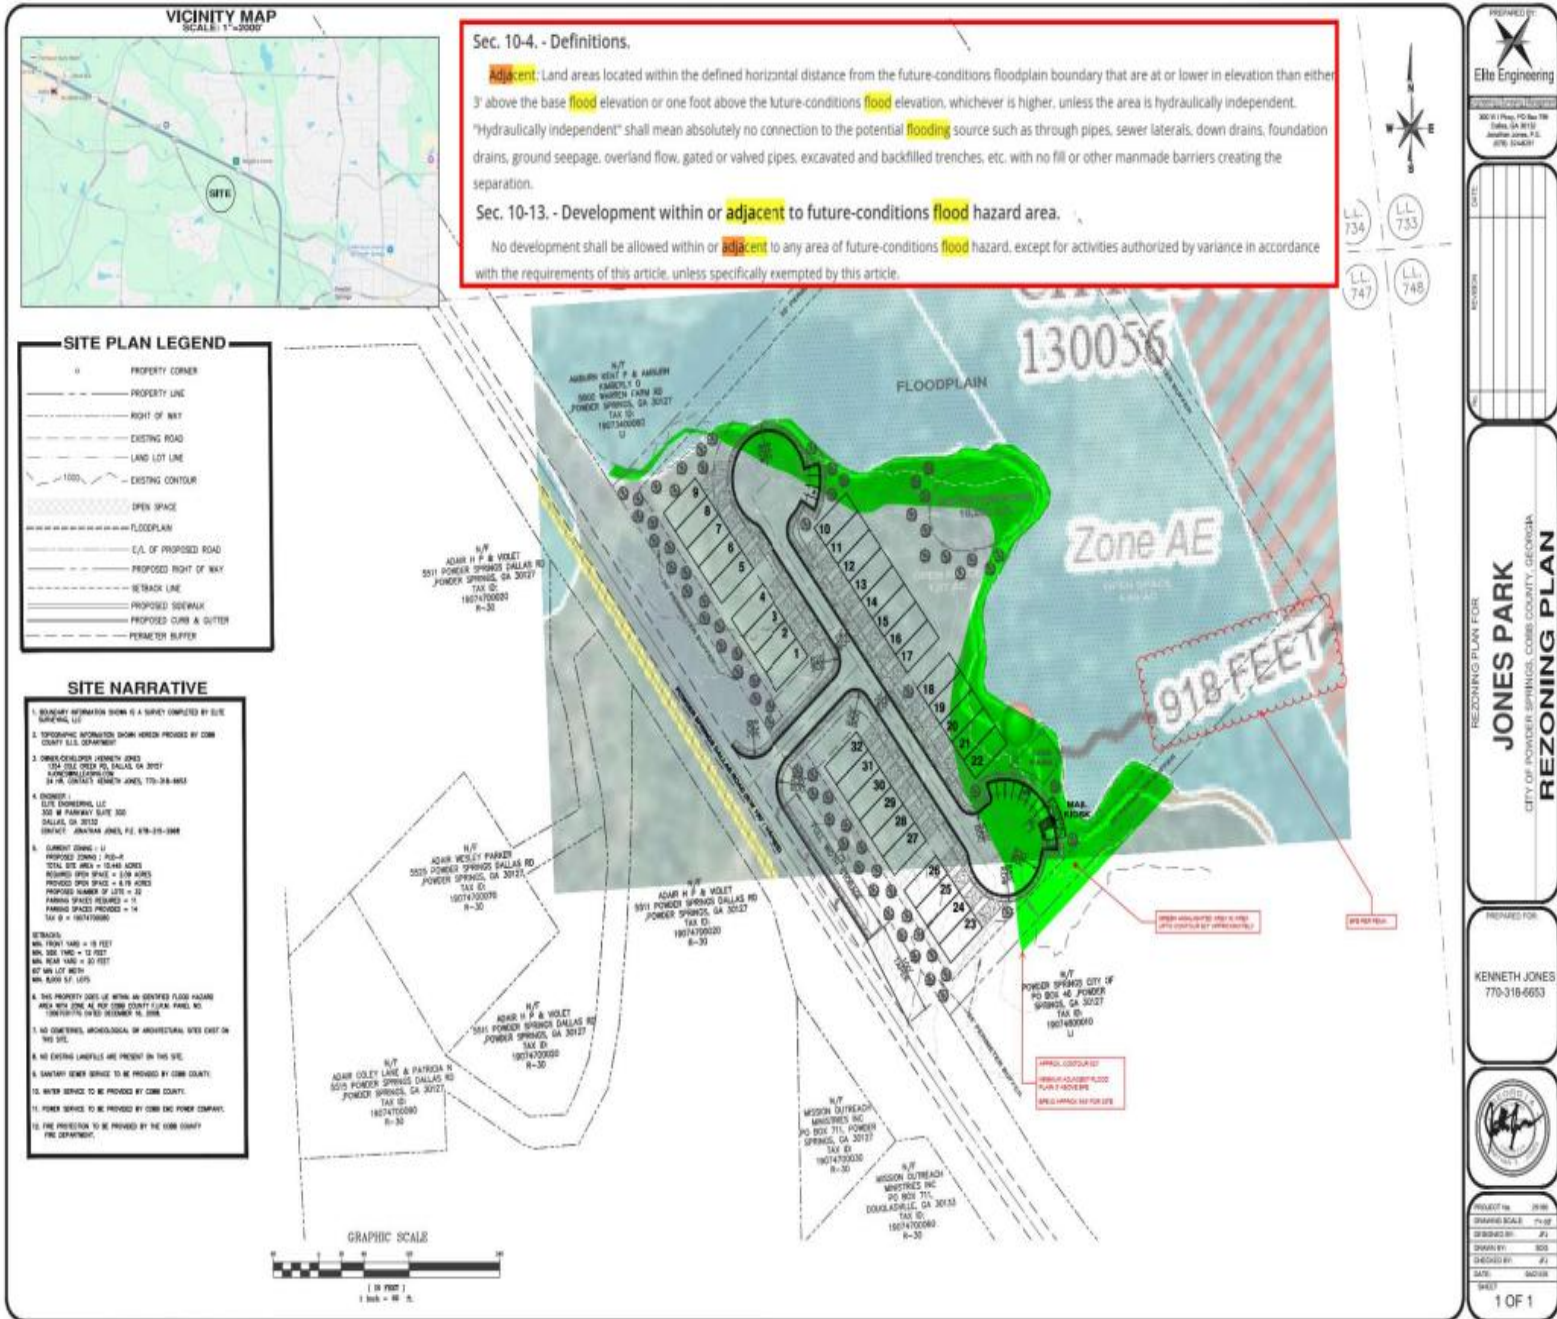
Site Plan with overlay of floodplain/floodplain adjacent areas on property (prepared by Staff and sent 05/21/2026 to Applicant)
